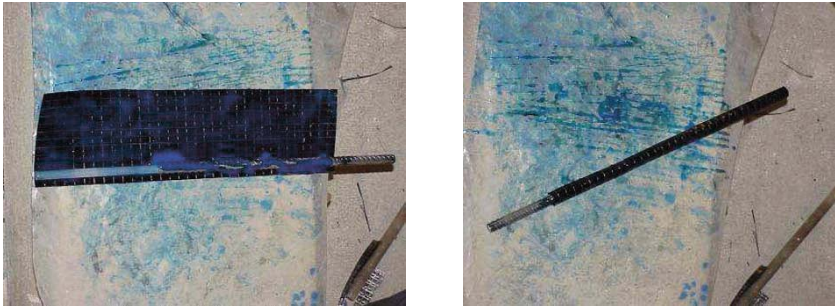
Epoxy coated CFRP sheet rolled around silicon and steel rod
